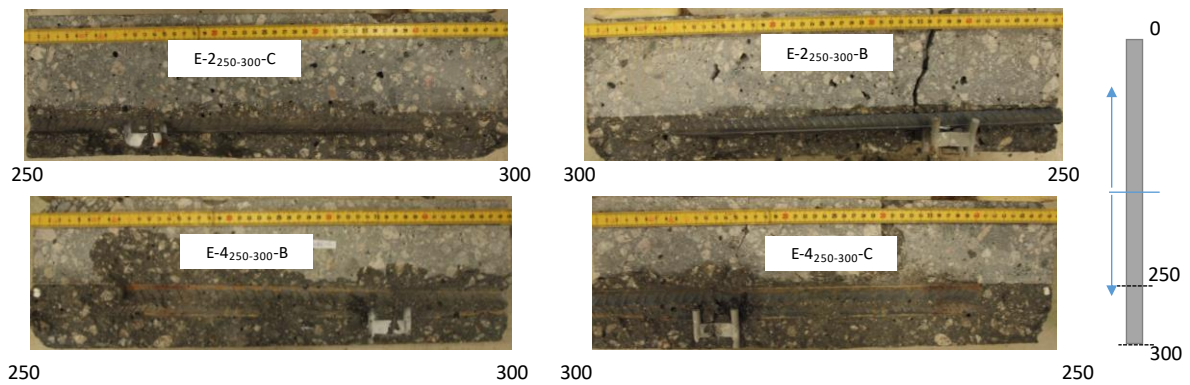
Steel-concrete interface of beam B section 250 to 300 cm. Superficial rust
